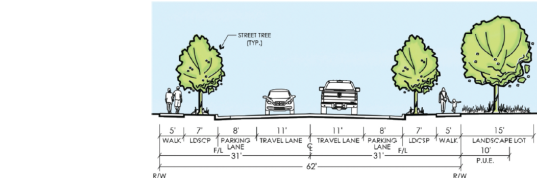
INTERIOR COLLECTOR ROAD (RESIDENTIAL FRONTAGE)
